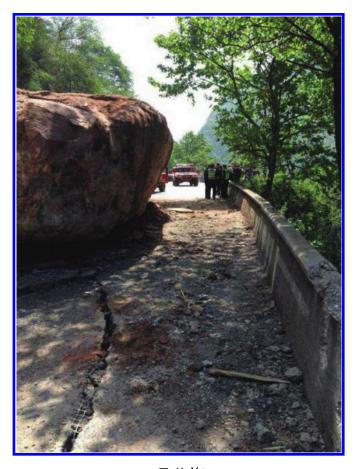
S210 damage on Feixianguan (飞仙关) Road by large boulders (Courtesy Dr. LIU Aiwen of CEA)
